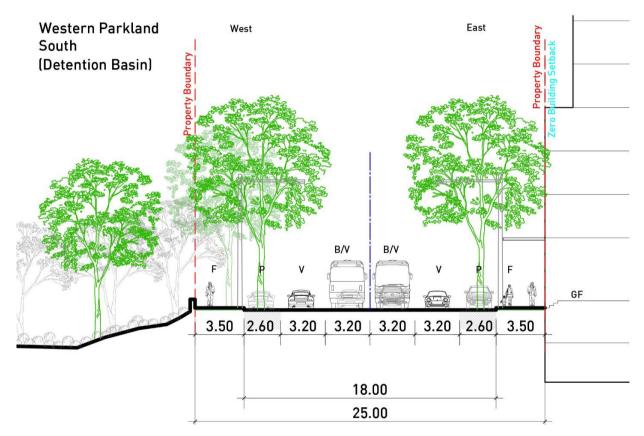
Type 1C Major Road Town Centre and Western Park Interface (NSR 2)
